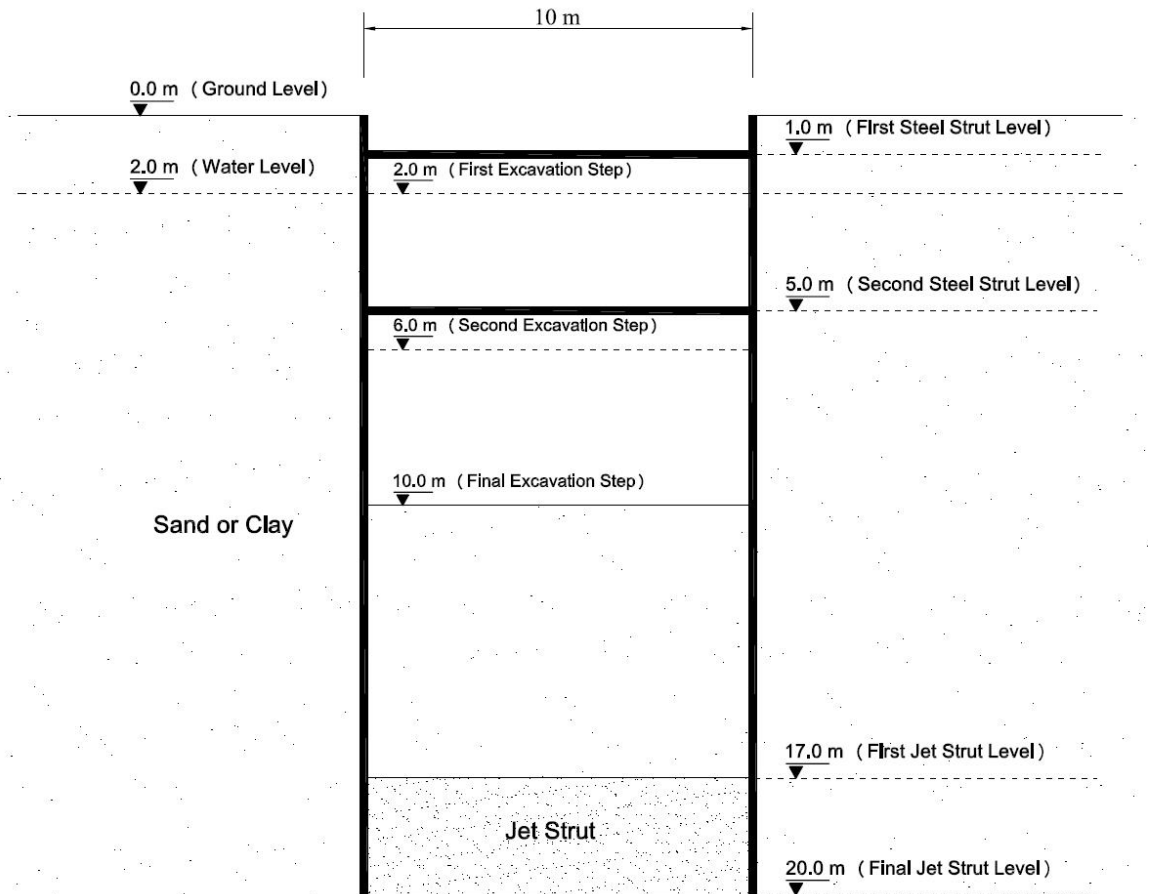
Jet Grouting Strut Location IV: Jet struts between 17 m and 20 m
